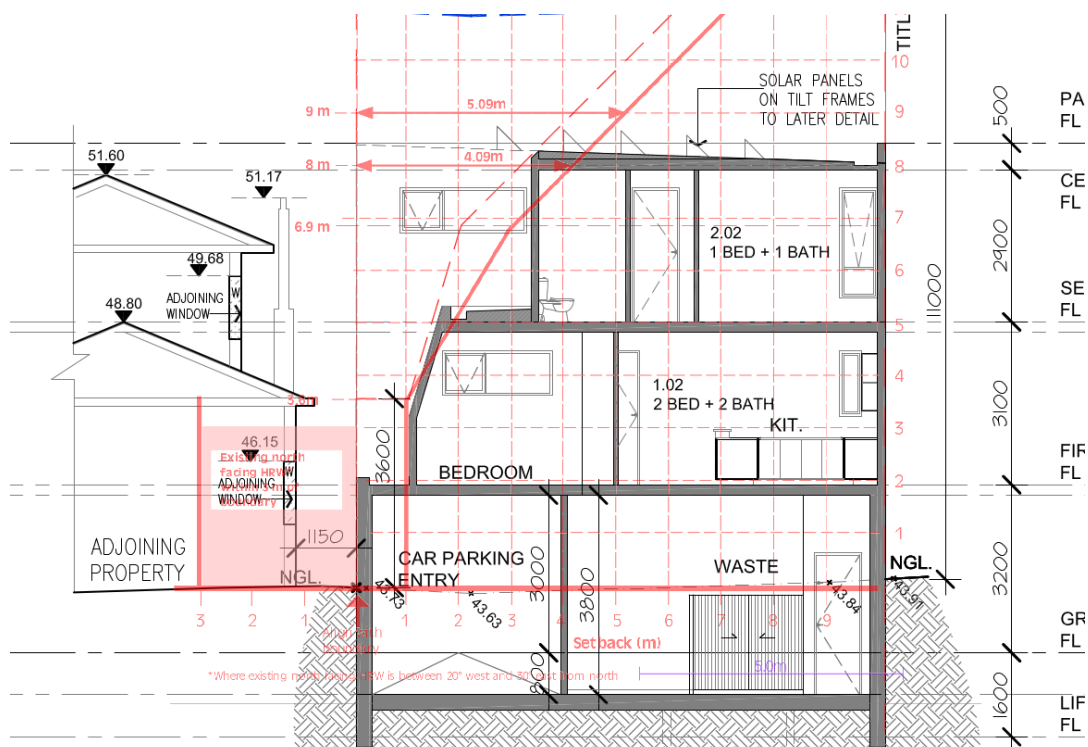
Mark-up plan of the required setbacks to the rear half of the building to comply with Standard B20.
